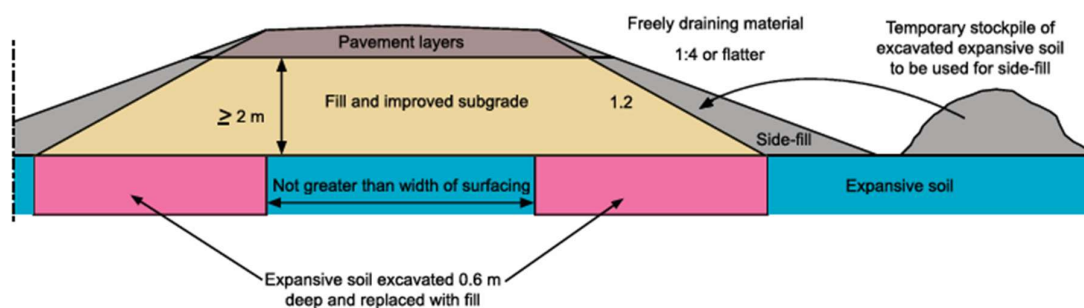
Construction on expansive soils (embankment height > 2 m) [11]
